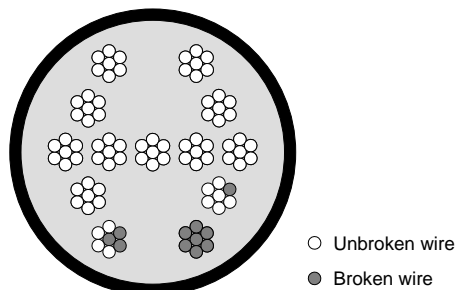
Wire Breaks in Strand 1 near Tower End – Specimen 6
